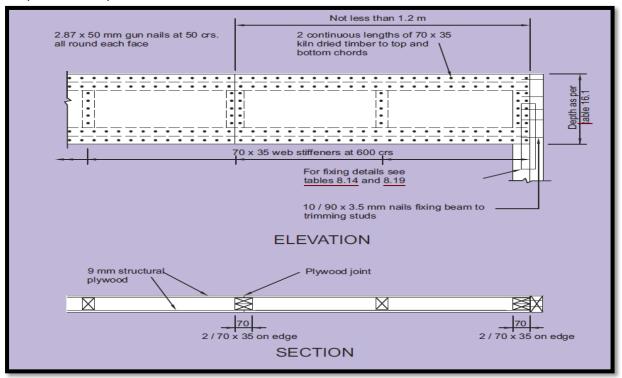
Sample of plywood box beam construction from NZS3604 fig16.2
